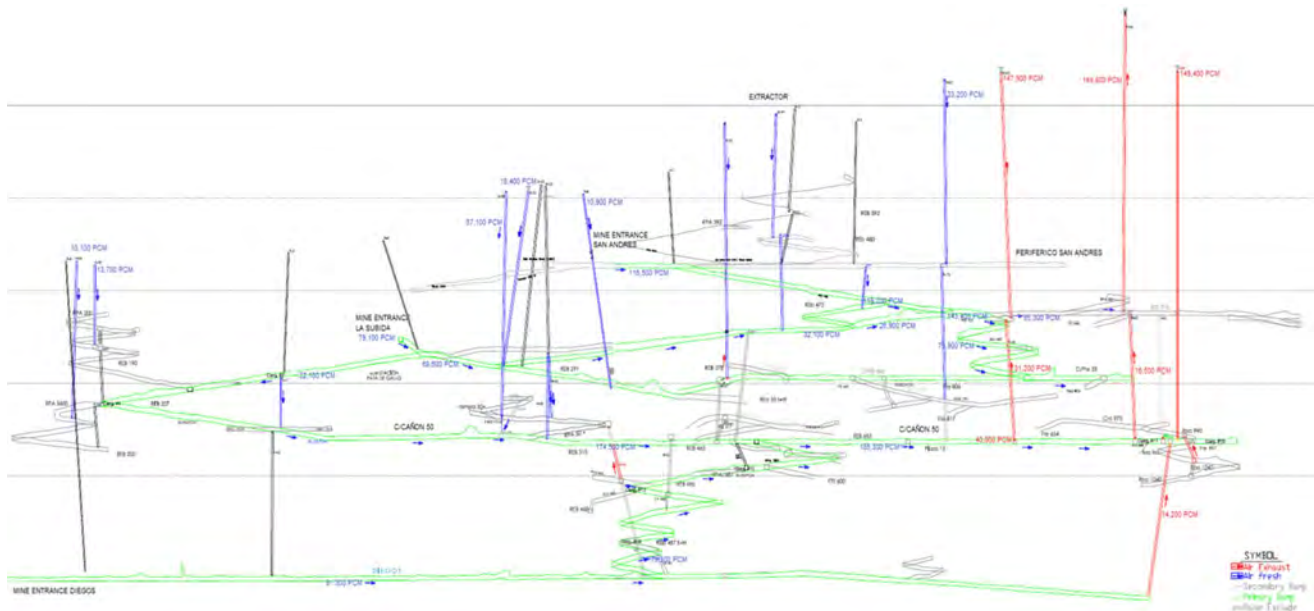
Development and Ventilation Plan, Los Filos Underground, Peninsular Mine
